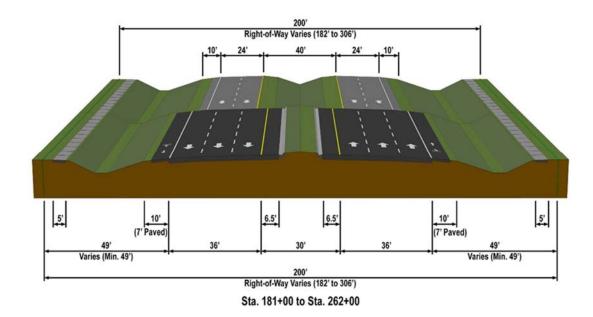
Suburban Typical Section – Alternatives 1 and 2
